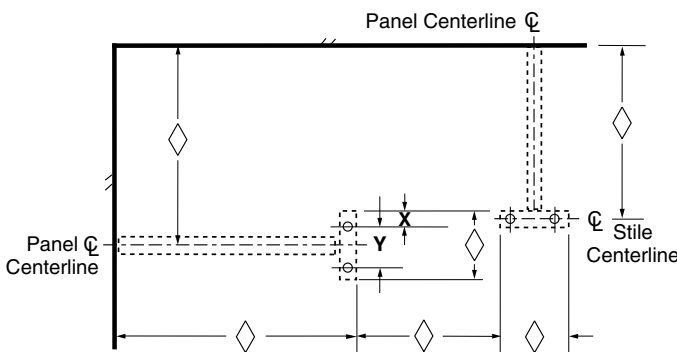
Ceiling-Hung Alcove Closed Layout.
